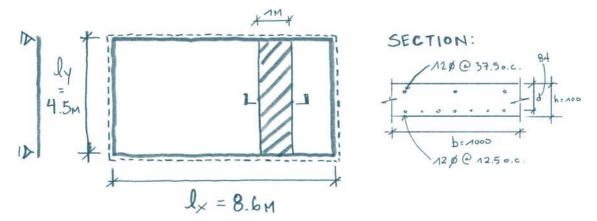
Typical one-way roof slab, static scheme, and analyzed section
